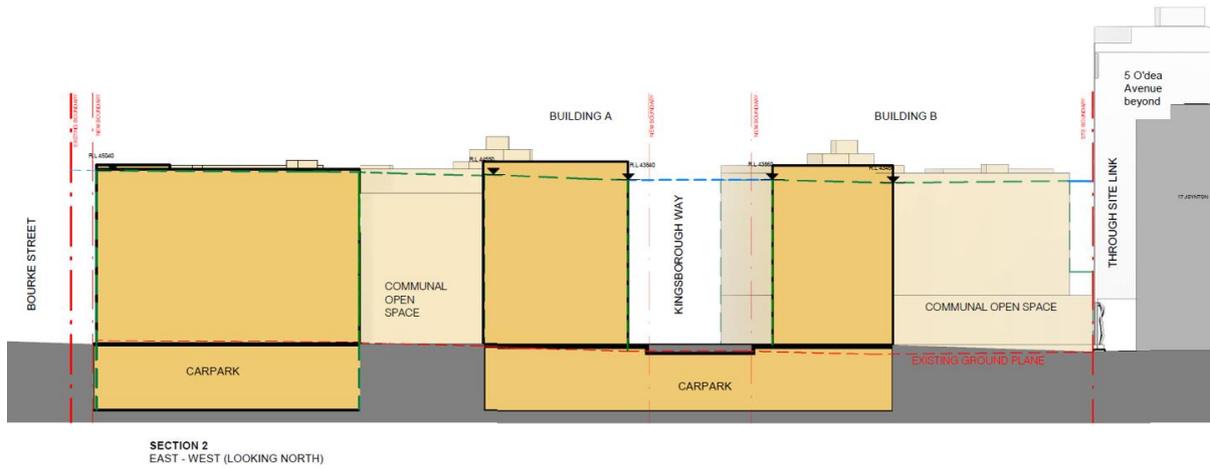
Proposed section east-west. Approved concept building envelope outlined in green and approved 22m height outlined in blue.
